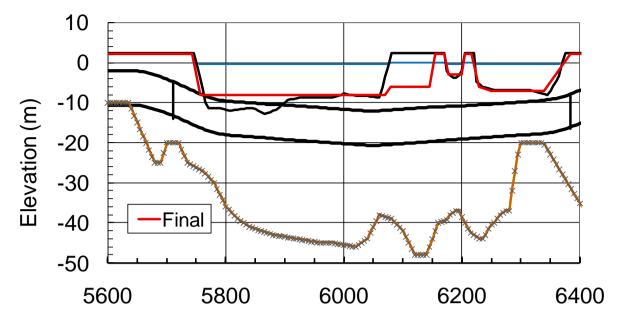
Longitudinal profile showing tunnel, original seabed, backfilling level and bedrock level along the immersed tunnel
